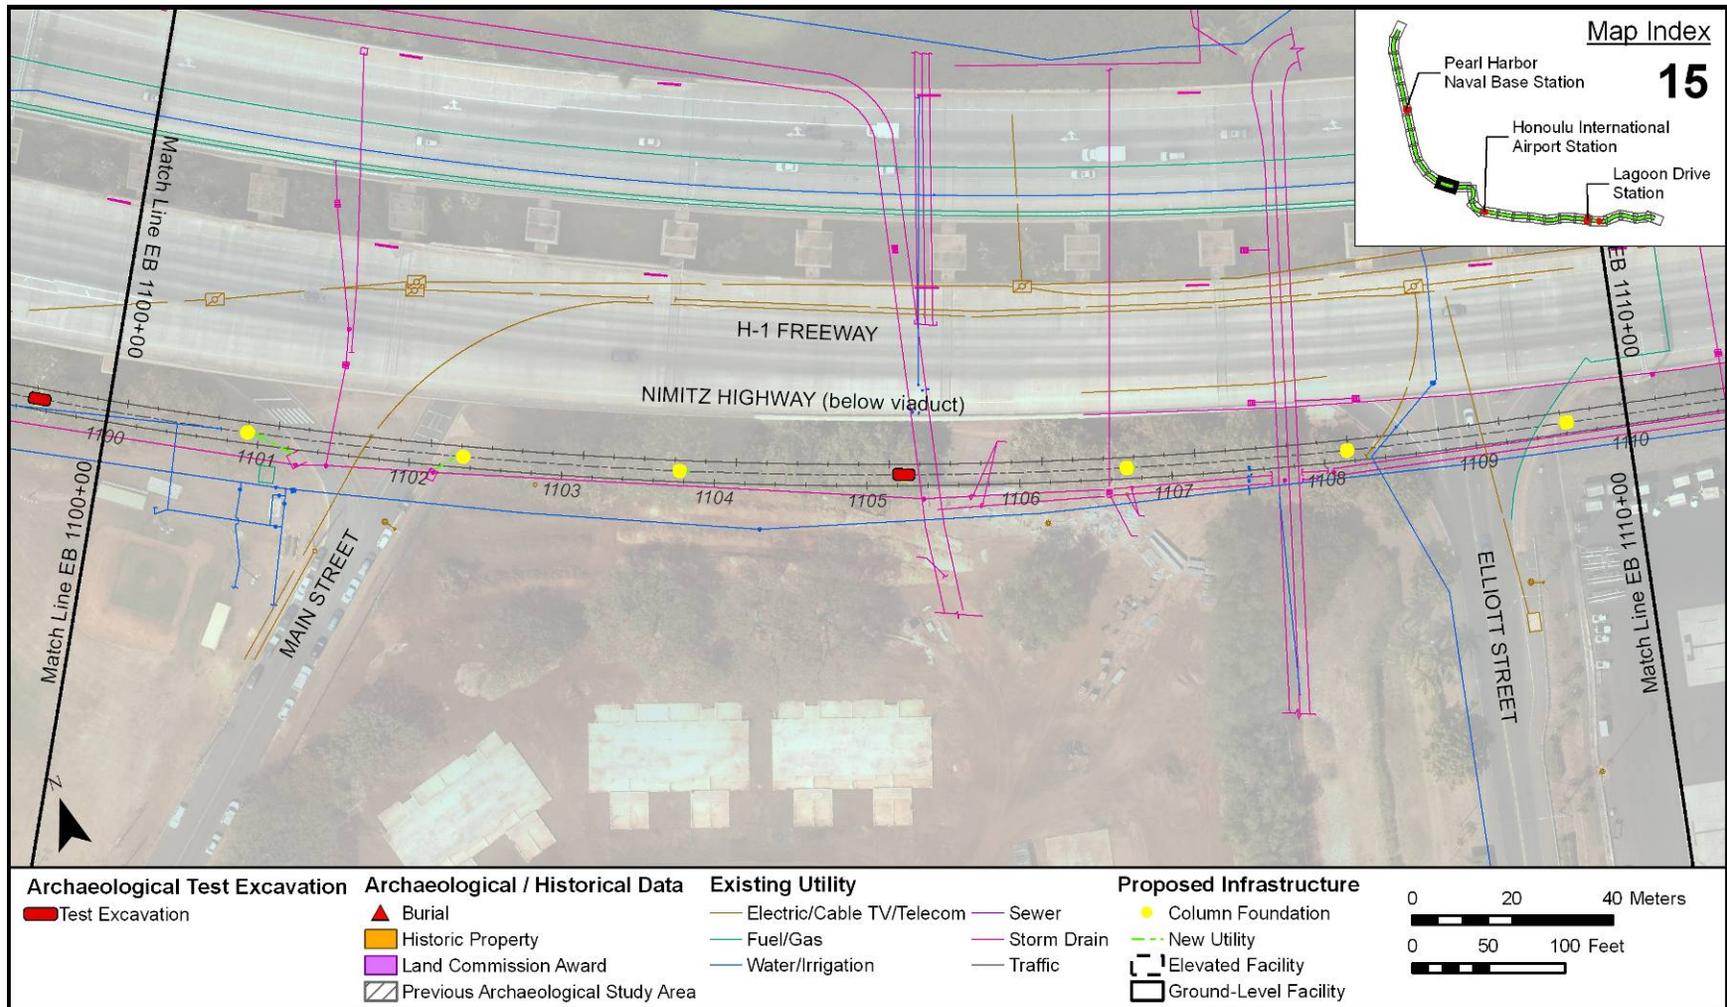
Map Sheet J-15, one 10x3 excavation at column foundation @ 1105+20
